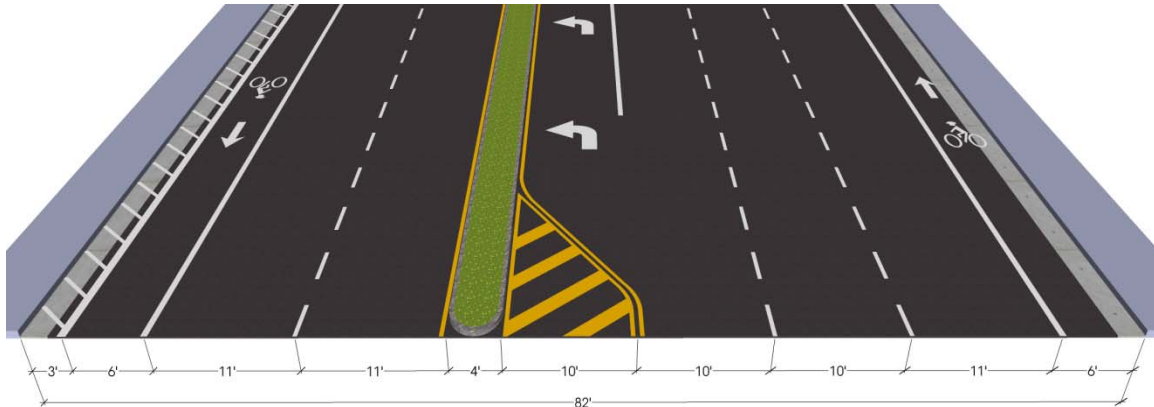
Plan View of Bataan Street (9th Street) to Warfield Street (11th Street)
